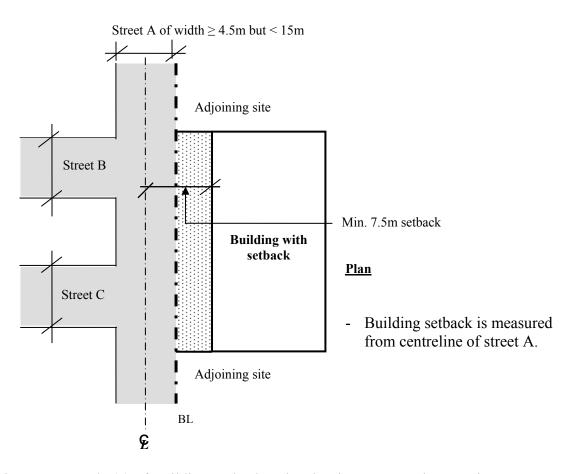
Example (3) of Building Setback - Site abutting streets at intersections
